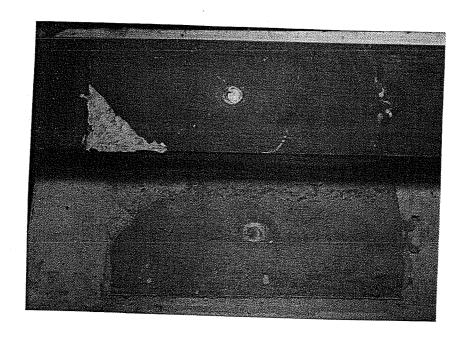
Concrete bonded to steel section by epoxy - Test ME3h-SS
